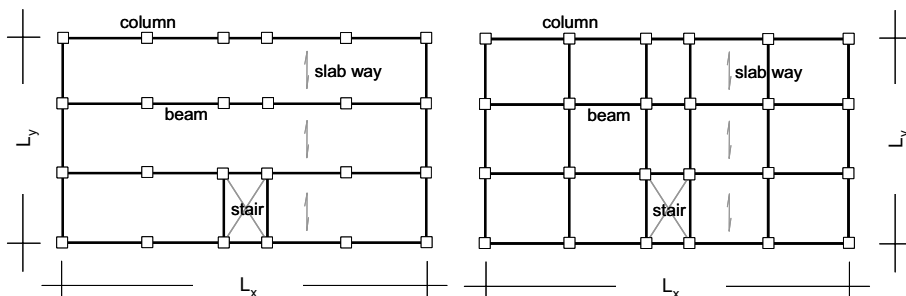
Structural configurations of the considered building types: gravity-loads designed (a) and seismic design (b).
